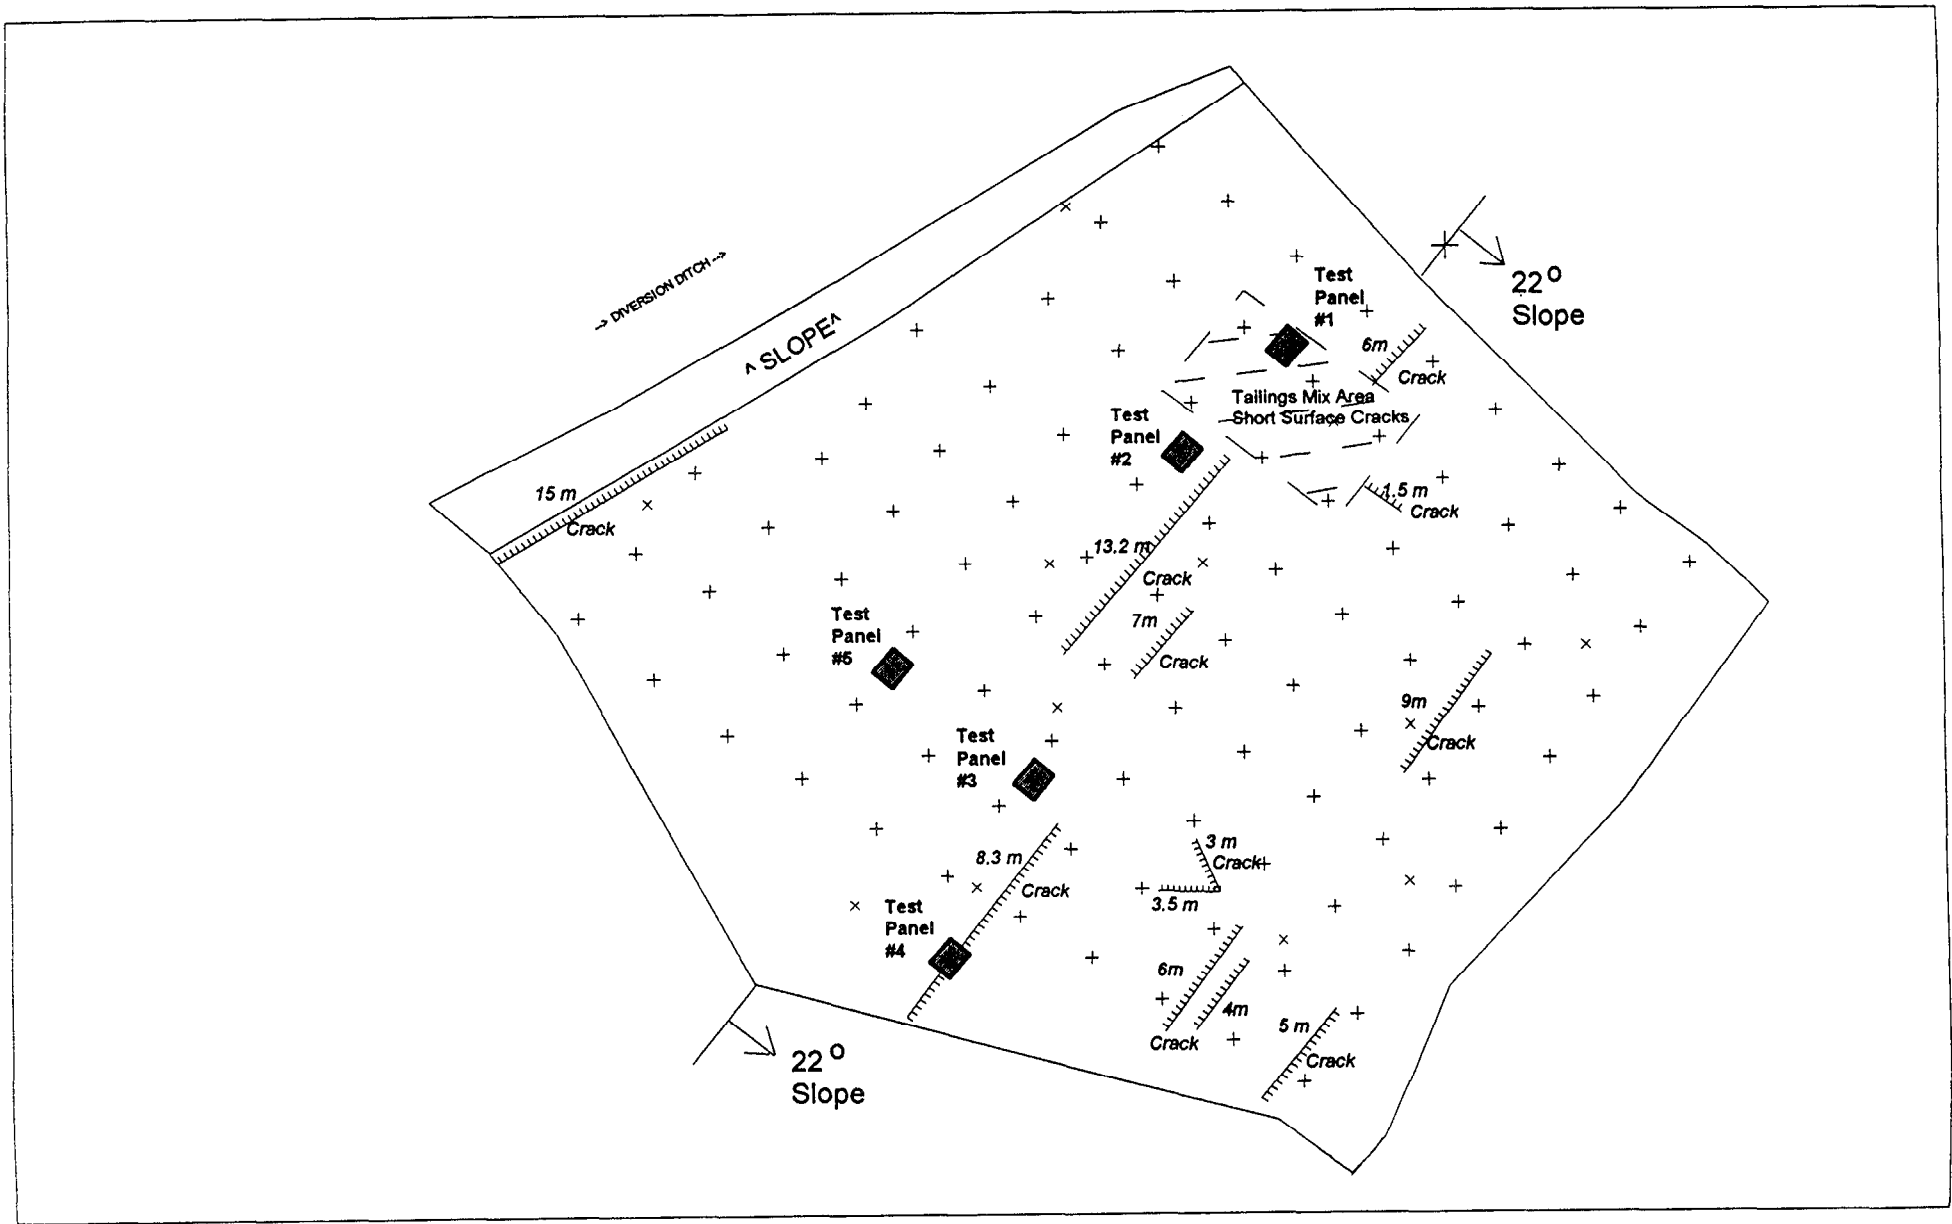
1995 Inspection: Locations of sample panels and cracks in shotcrete
